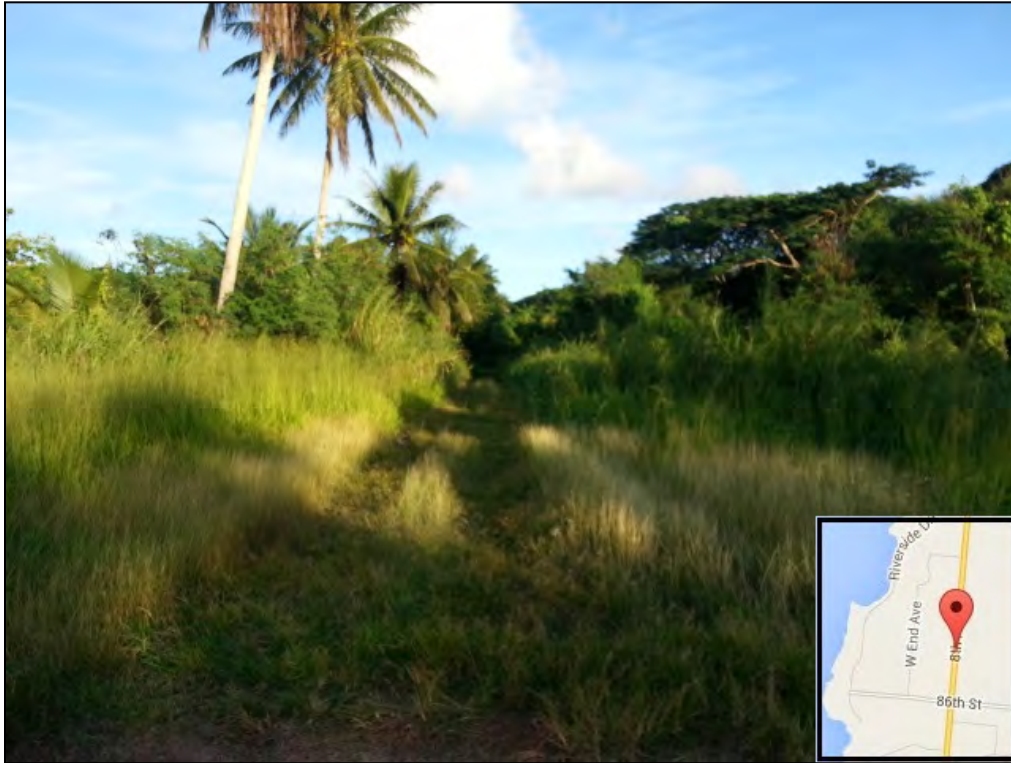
100th Street at 8th Avenue, Facing East
